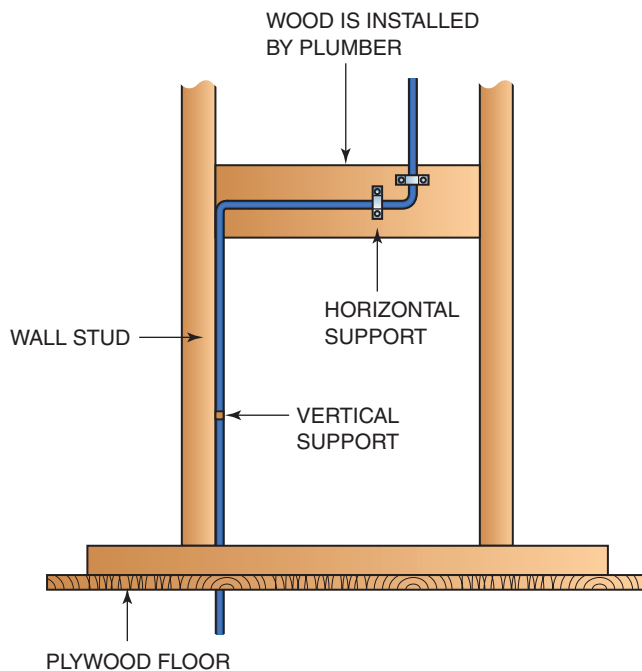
Wood is installed where required to support piping at necessary intervals as dictated by code or specific installation location.
